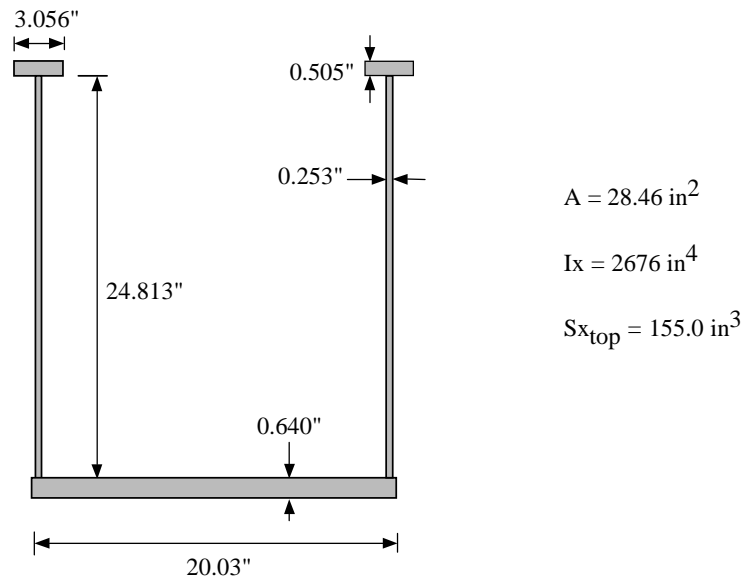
Cross-Sectional Properties of Rectangular Girder
